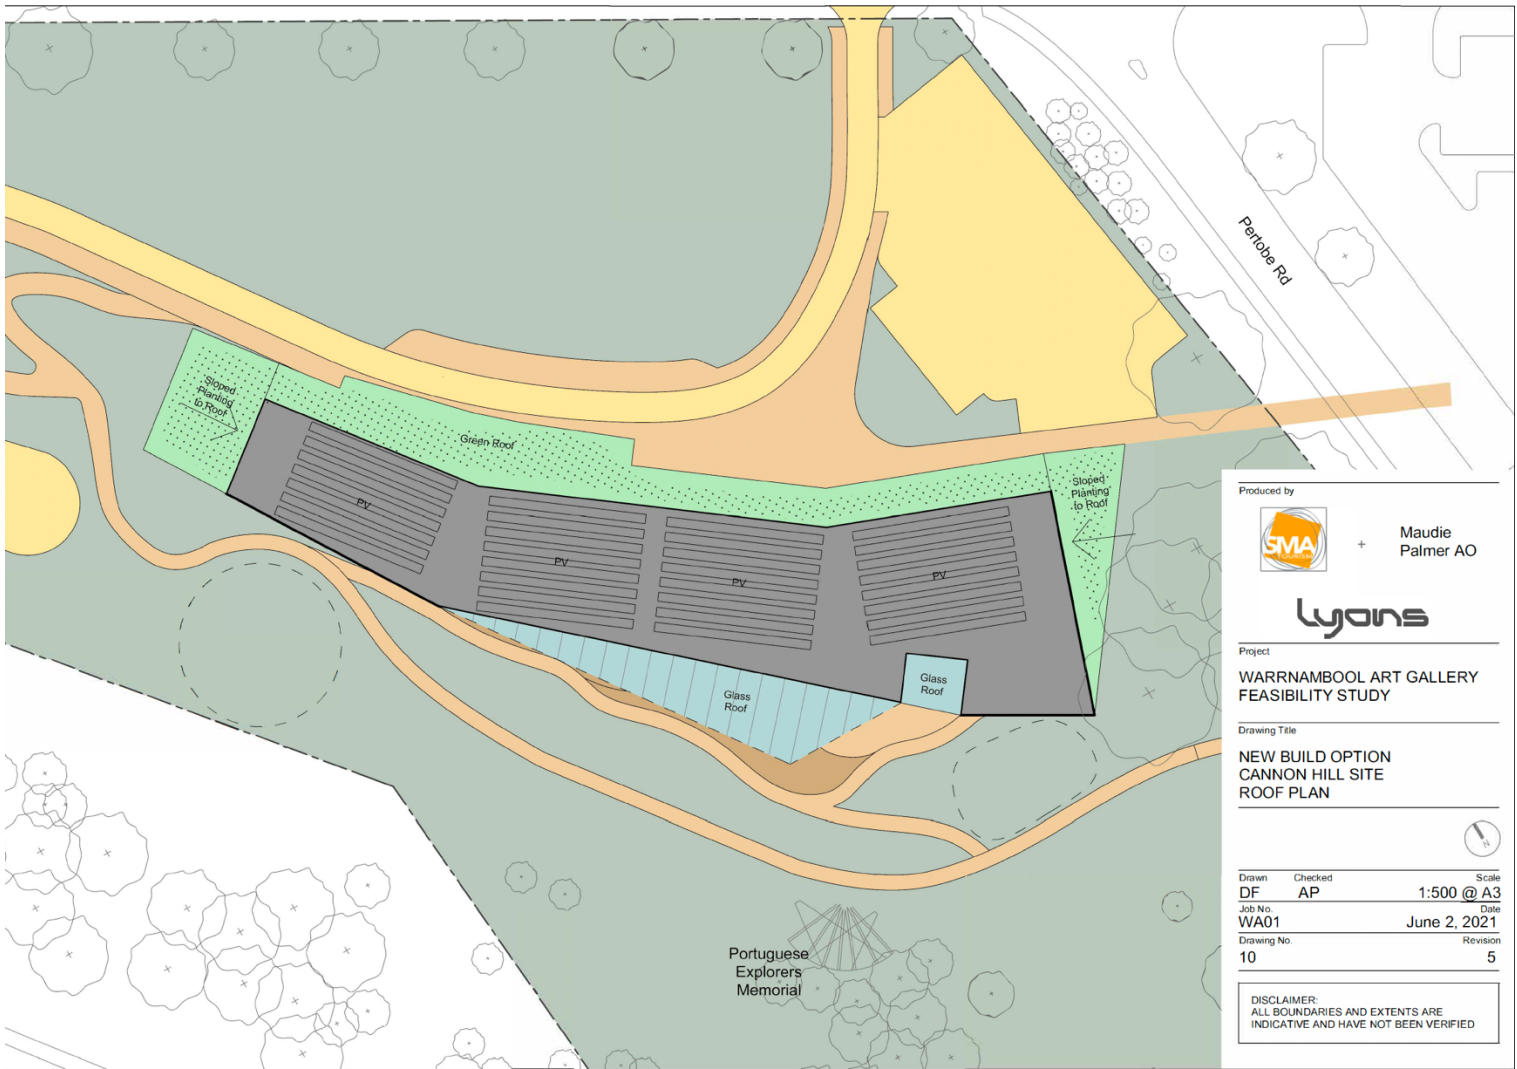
Concept Plan for roof on new build on Cannon Hill (featuring photovoltaic solar cells and green roof)
